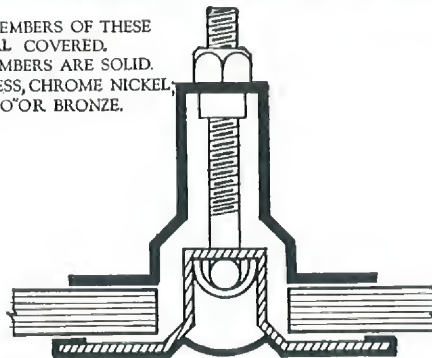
DETAIL OF CONSTRUCTION OF NO. 80 GLASS SETTING
